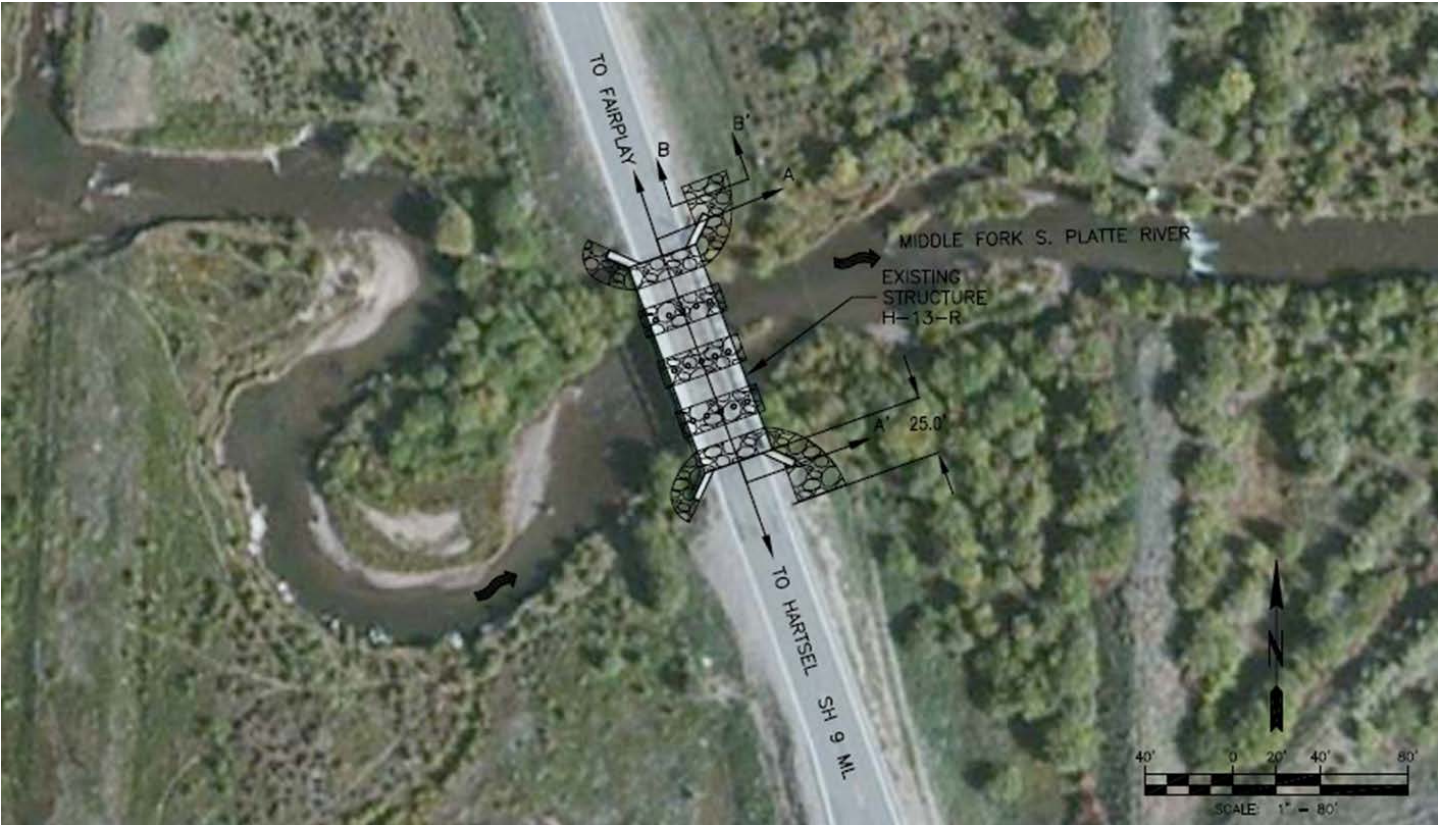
Plan view of Bridge H-13-R with recommended hydraulic scour countermeasure locations
